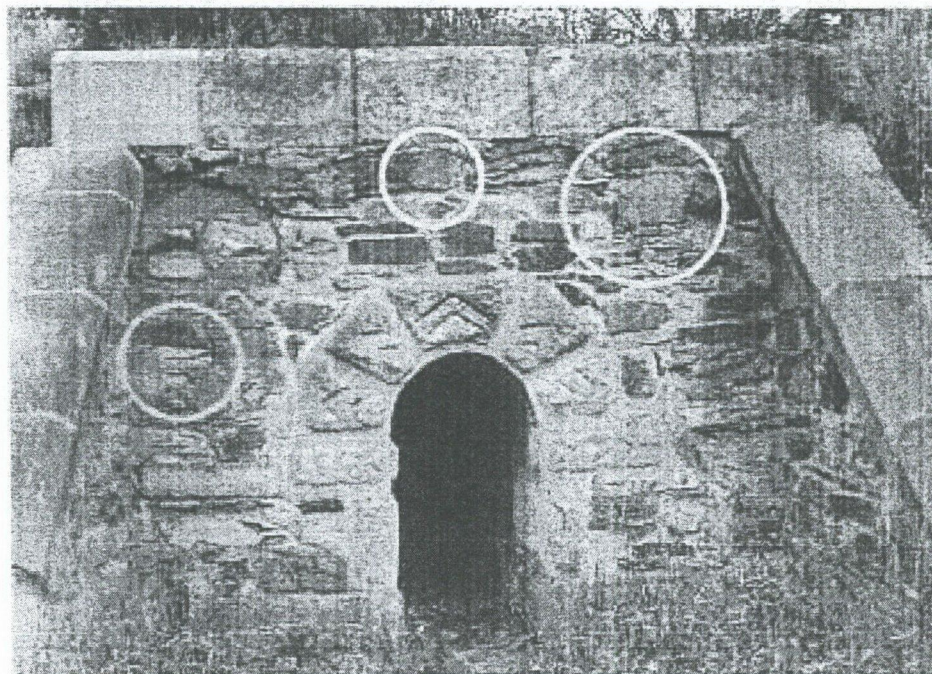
Photo of culvert 1 taken on 10/2/05 showing same features when compared to the 'claimed culvert 2'. This culvert was restored during the construction of the Derrick VC rest area.
